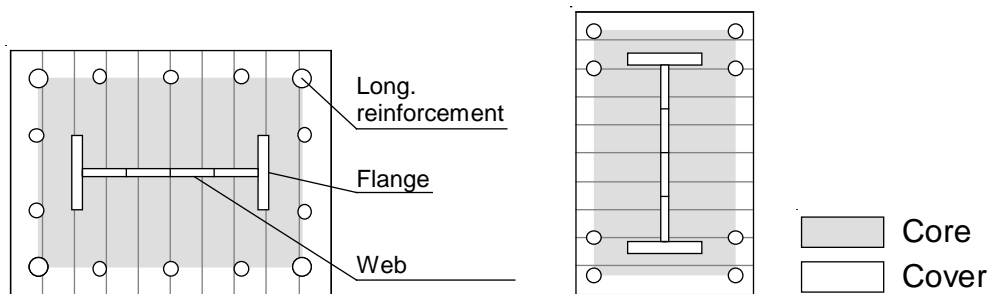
Modeling of the cross-sections of the columns (left) and beams (right)
